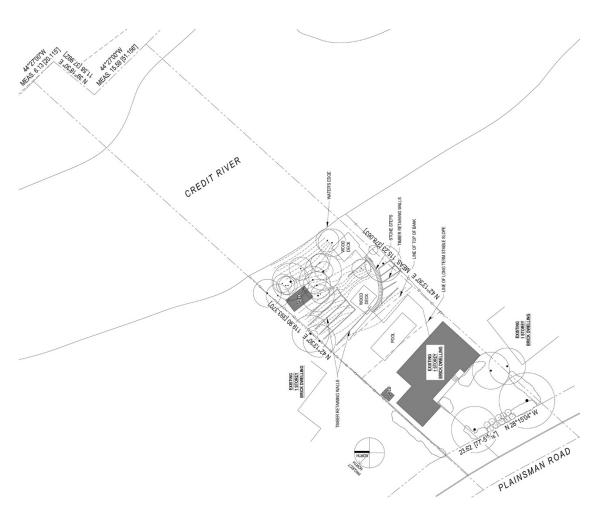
23 Plainsman Road Site Plan - existing conditions
